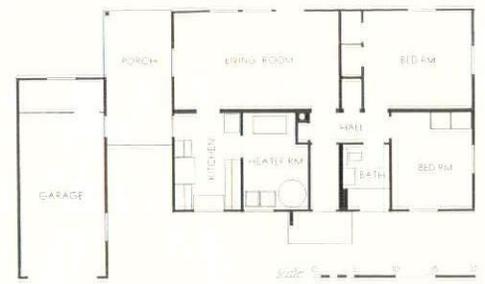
(left). Showing all house panels assembled and garage nearing completion. Figure 4 (above), plan of house
